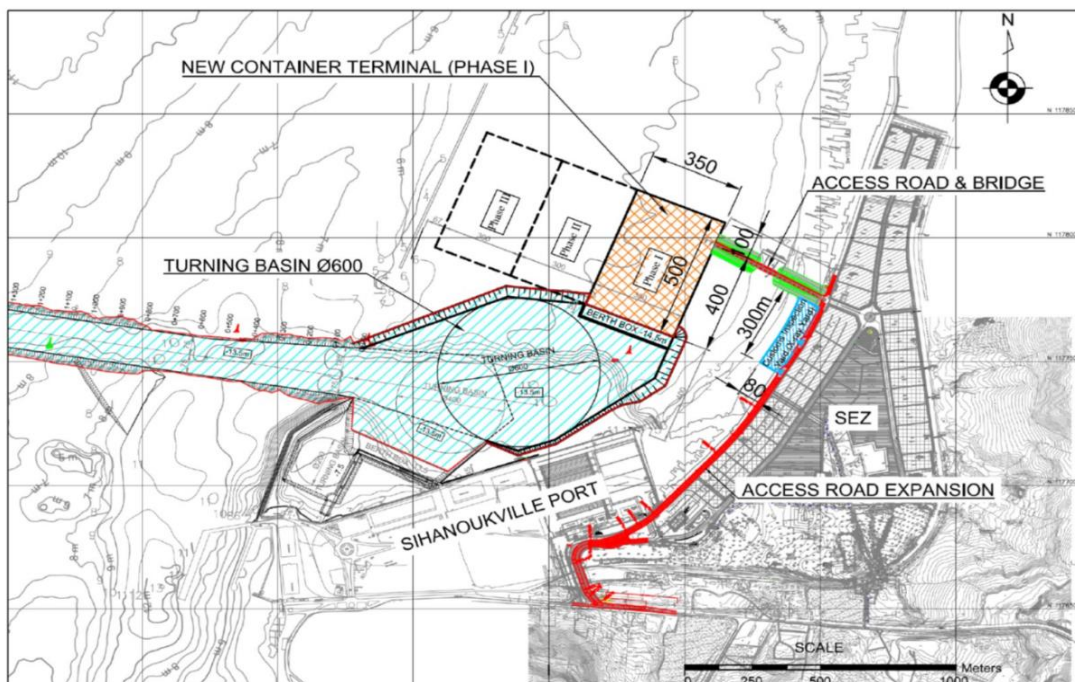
Layout of Sihanoukville Autonomous Port Development Plan
